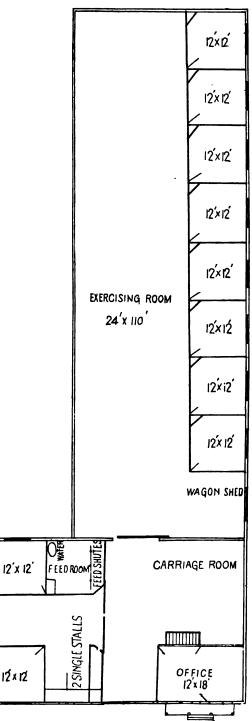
MODERN STALLION BARN (FLOOR PLAN).
